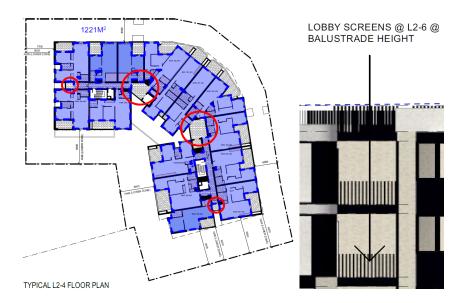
Exclusion of part open corridors from contributing to GFA (plan and elevation)
